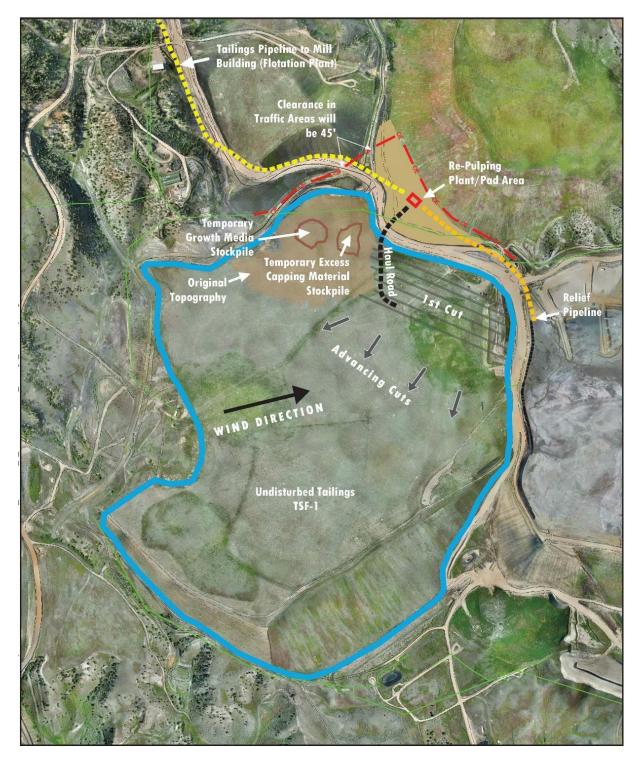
Tailings Storage Facility 1 Proposed Action Layout (GSM 2021)
